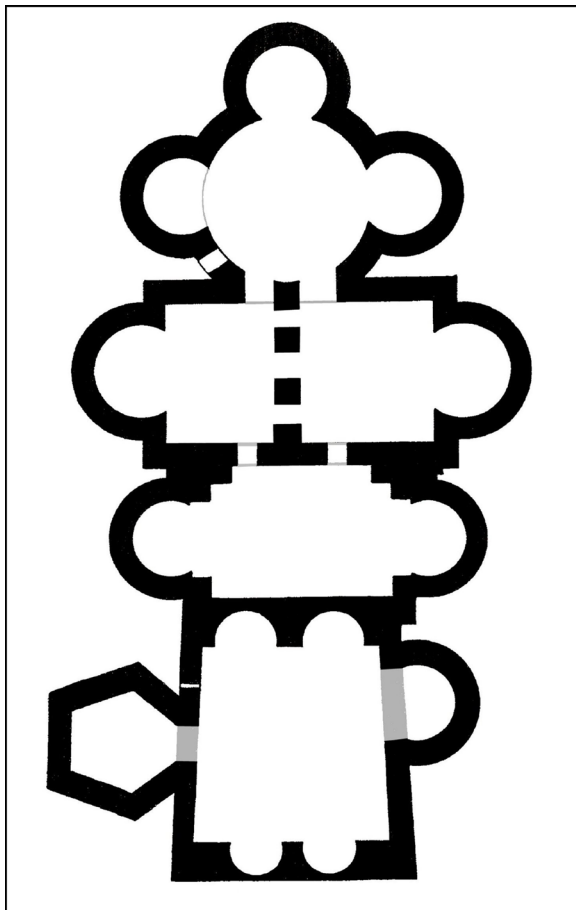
Villa of Torre Cardeira (Beja, Portugal), plan of the baths. Plan by John Stephenson.
